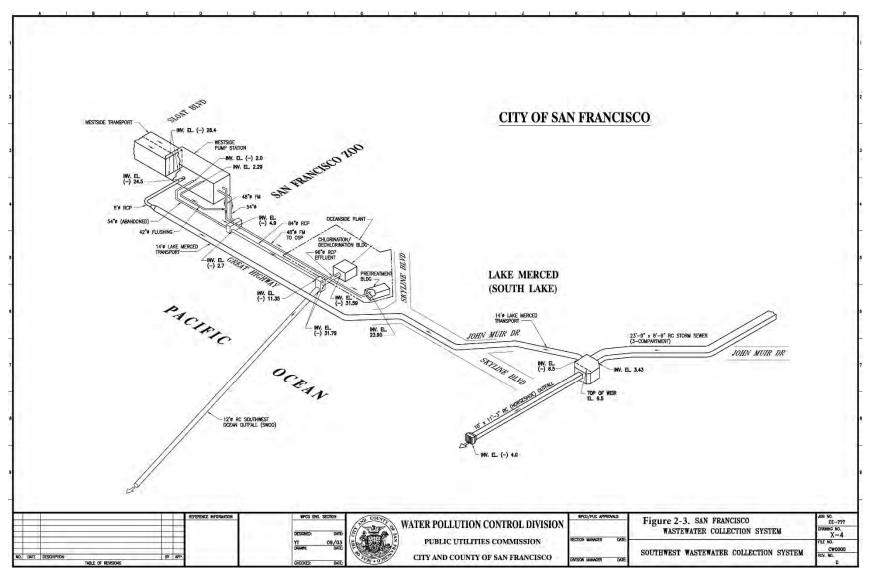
SFPUC Southwest Wastewater Collection System Schematic.
